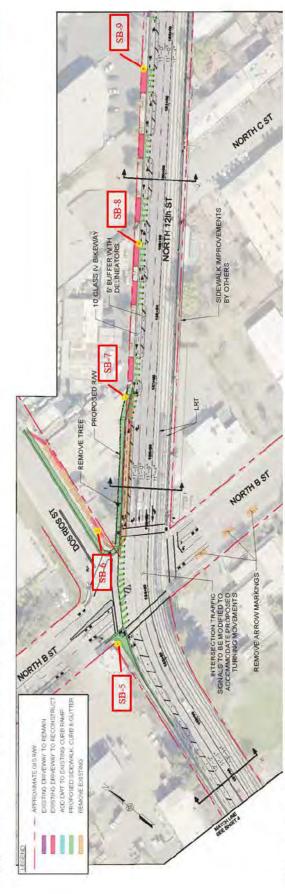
Soil Boring Locations SB-5 through SB-9, North 12th Street, Sacramento
